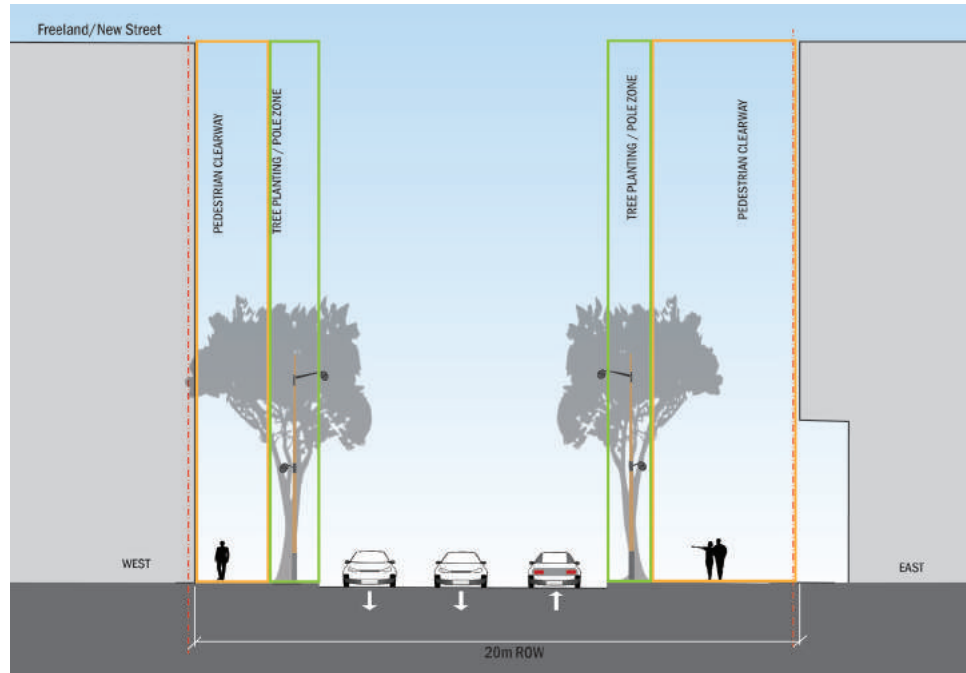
Freeland and New Street Cross Section (illustrative)
